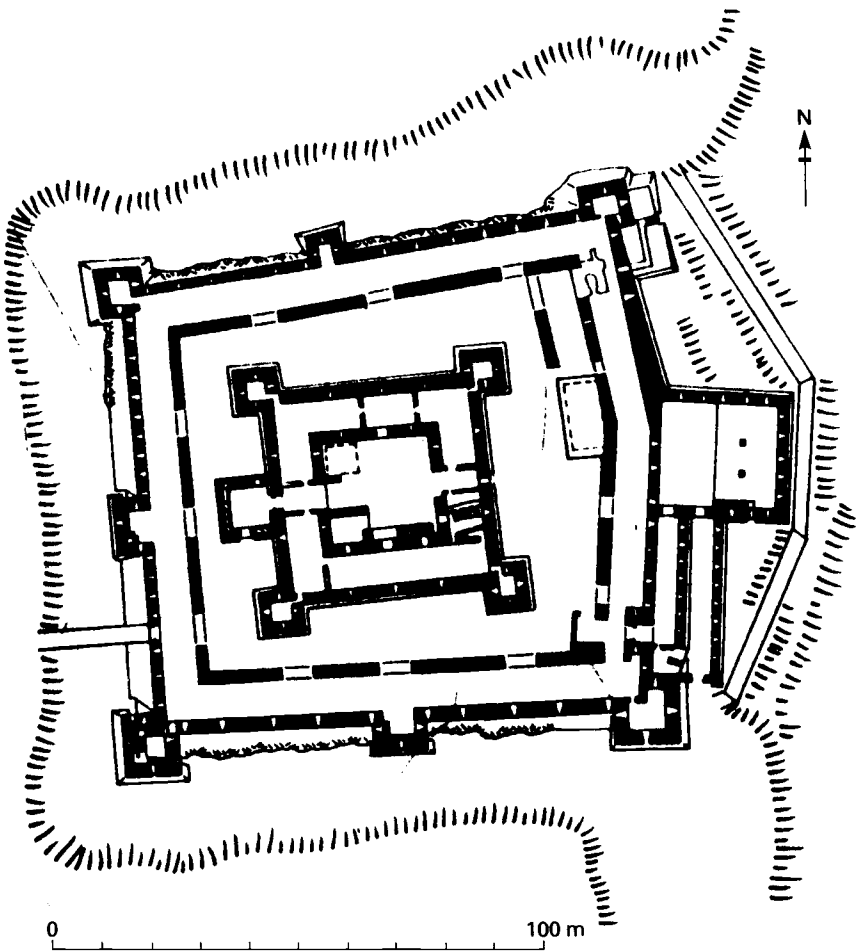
Belvoir: plan. The almost symmetrical plan shows a roughly square inner court with towers at each corner and the middle of the east side. This stands in an outer enclosure, again with corner and half-way towers. Both courts are surrounded by ranges of vaulted chambers, all now unroofed. Note the postern gates, leading to the moat, in the towers of the outer walls.
